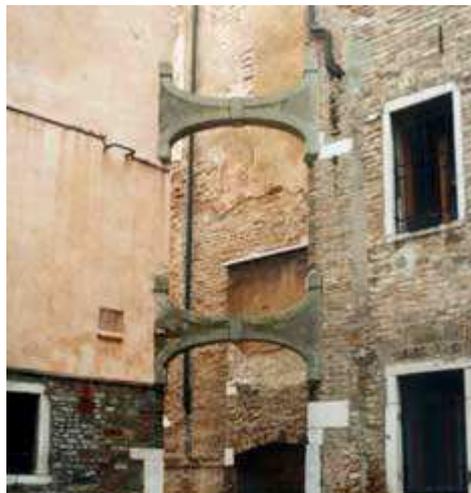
Strut arches connecting two buildings. (EU-India cross program, 2006)
